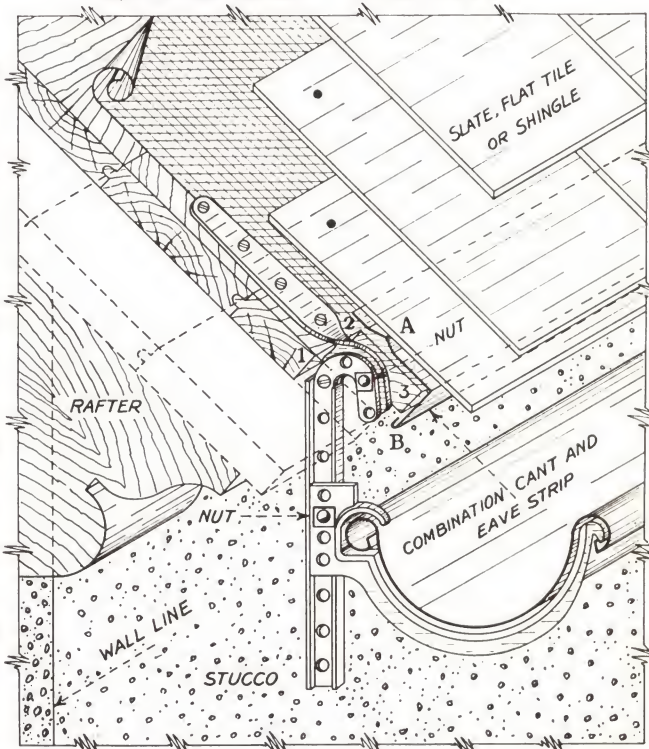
DOUBLE BEAD EAVE TROUGH IN CAST HANGER HAVING ADJUSTABLE SHANK TO SCREW UNDER SLATE, FLAT TILE OR SHINGLE - SCALE - 2"-1'-0"
